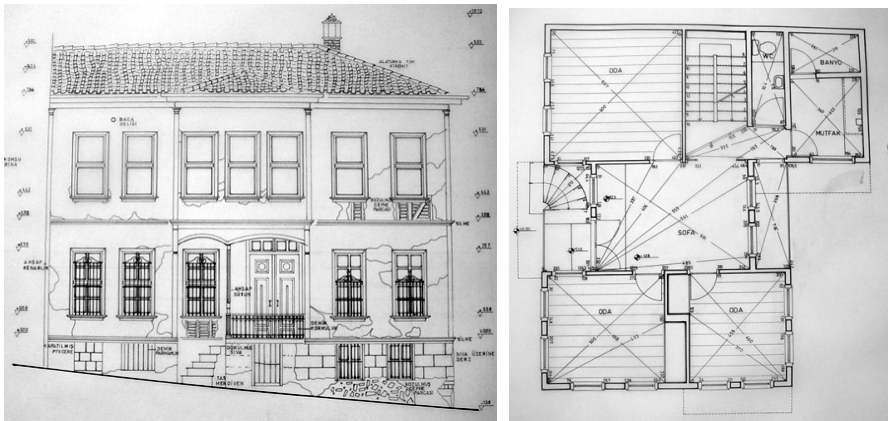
Mimarlar Odasi House Front Elevation and First Floor Plan
